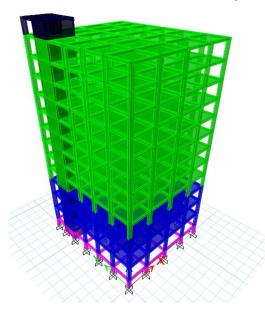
3D view of (G+12) storied commercial building for Plan 01
